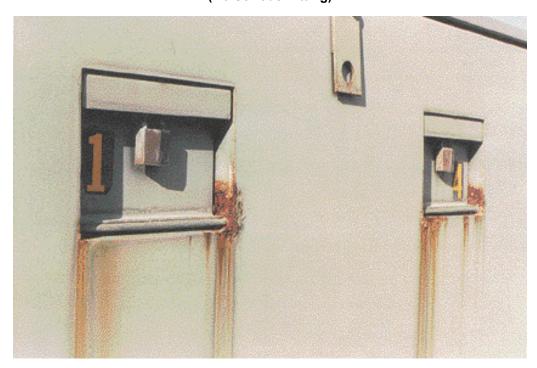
Light Corrosion at Louver Openings and at Base of Cabinet (No Serious Pitting)
